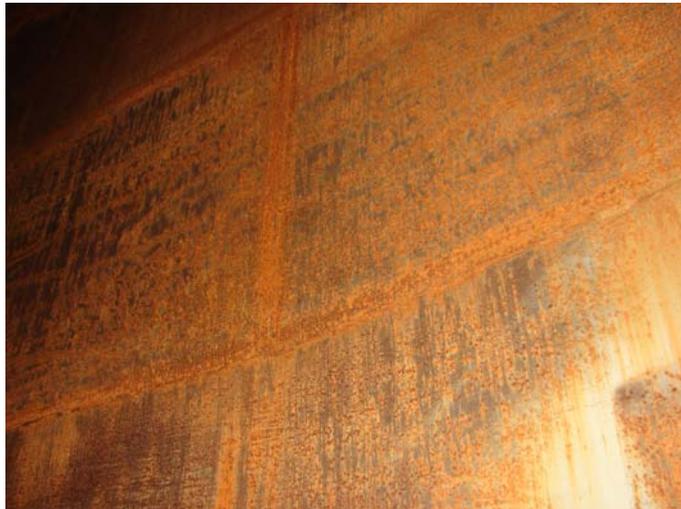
Horizontal lap joints in the shell with a single angle weld outside
